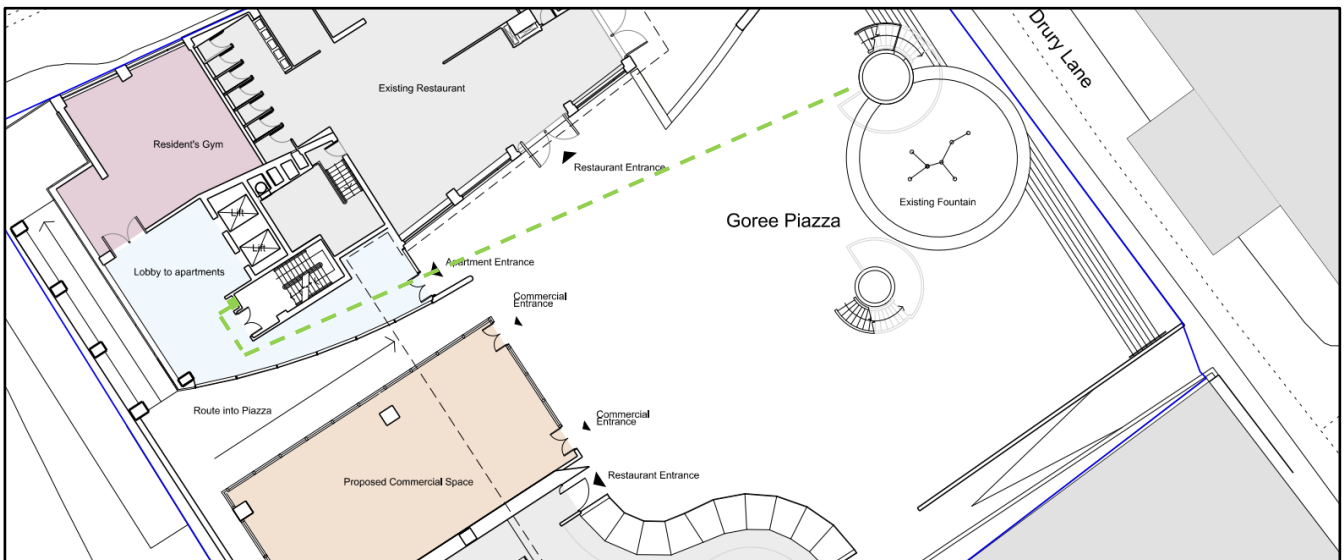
Ground floor plan showing possible wiring line on carpark ceiling below
